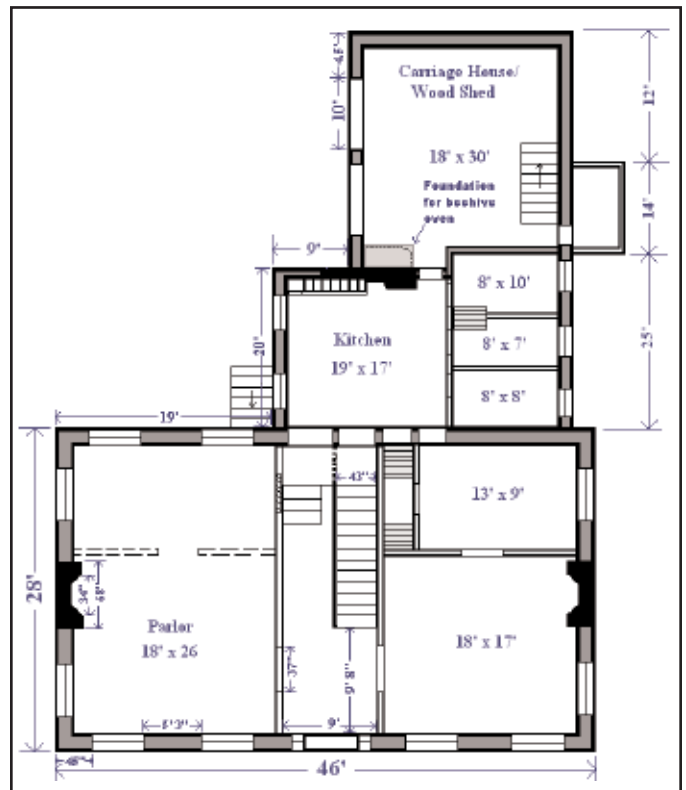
First floor plan of the brick house. The house is located 68 feet from the road.
